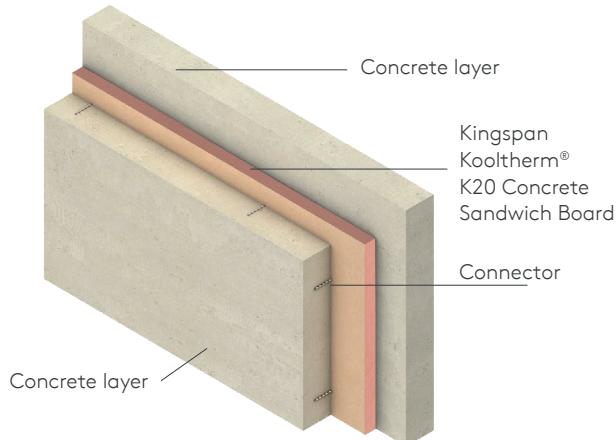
Kooltherm® K20 Concrete Sandwich Board Installation
